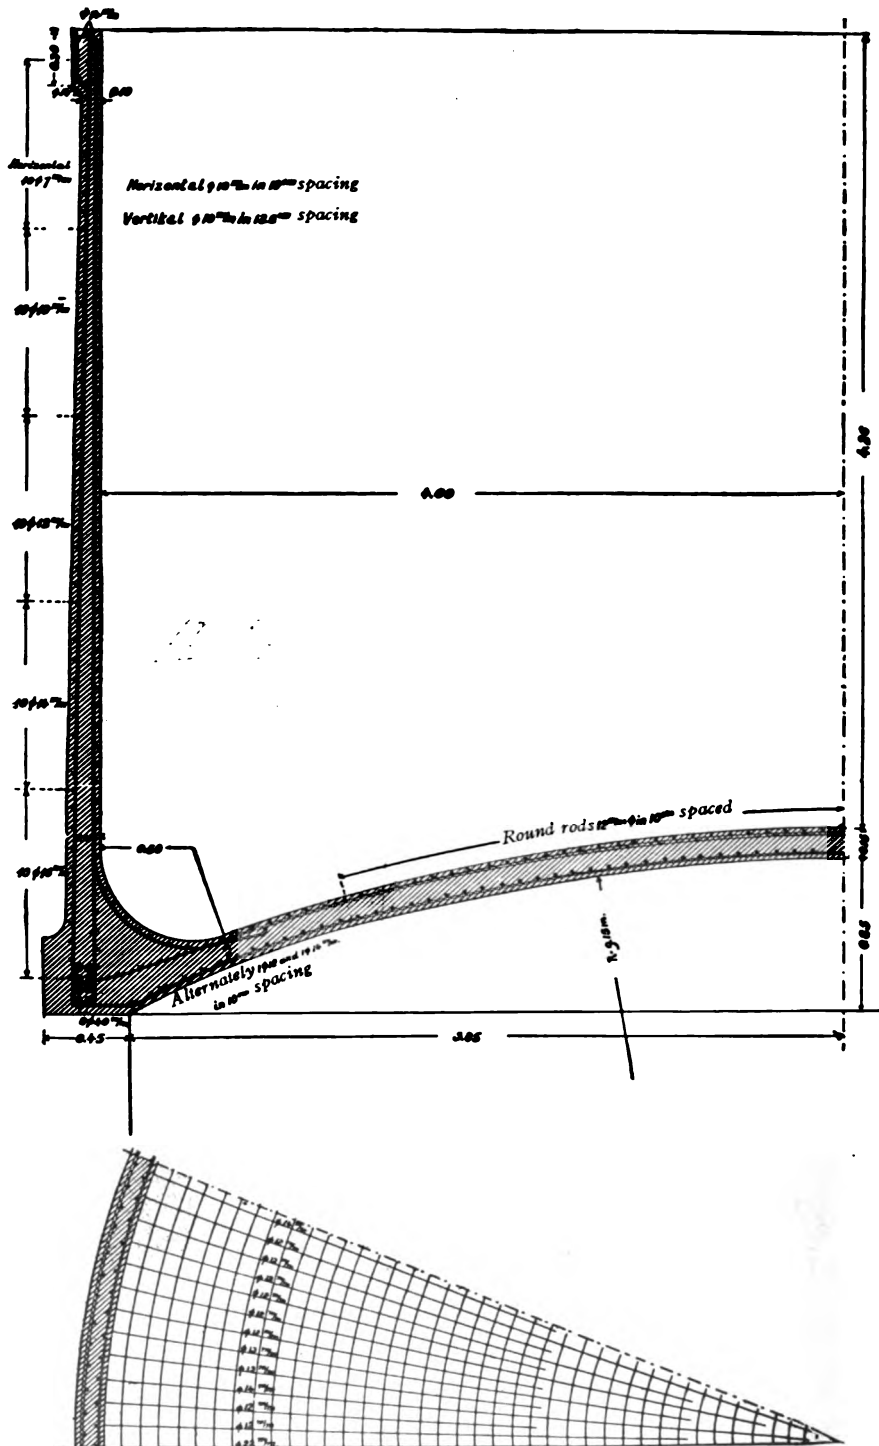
Cylindrical tank with dome-shaped bottom. Detail of reinforcement.
